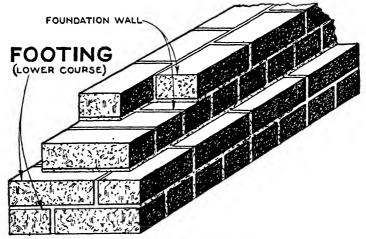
,354.—12 in. brick footing supporting 8 in. foundation wall.
